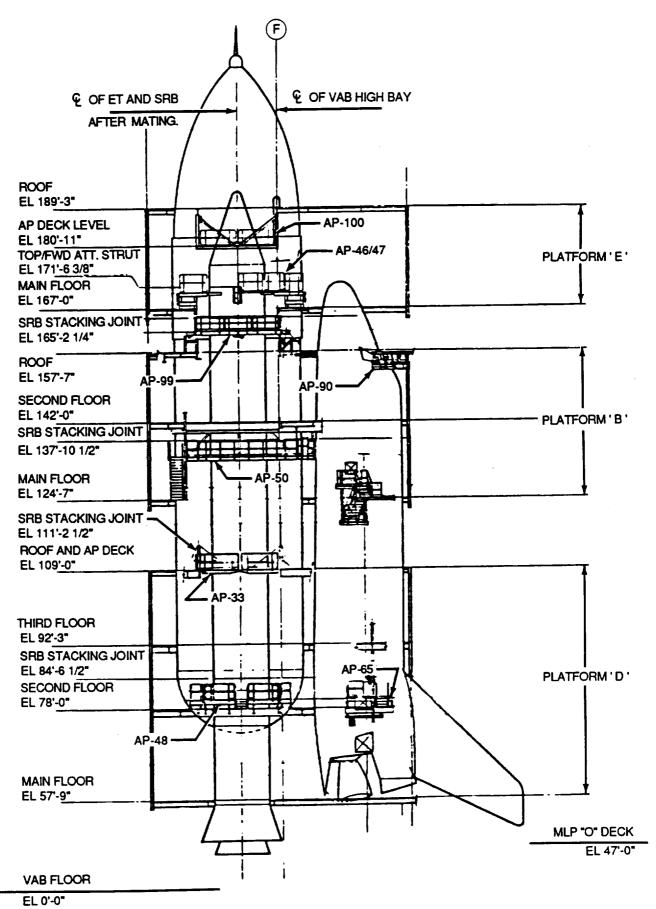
Existing Vehicle Access Platforms and Key Elevation (High Bay 3).
